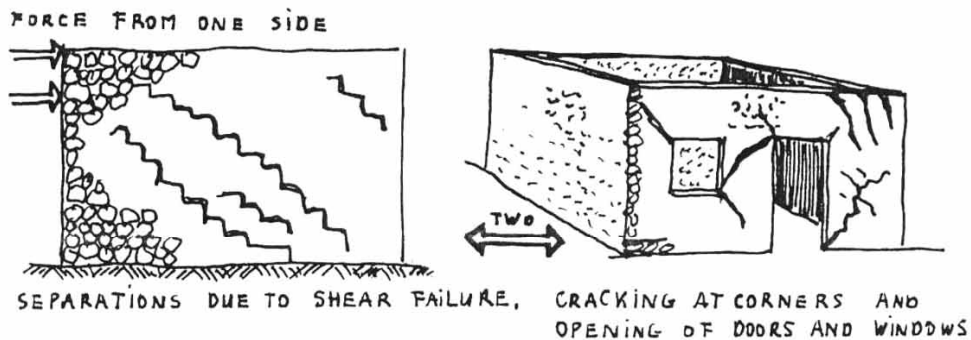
FAILURES IN STONE WALL CONSTRUCTIONS CAUSED BY SHEAR FORCES
